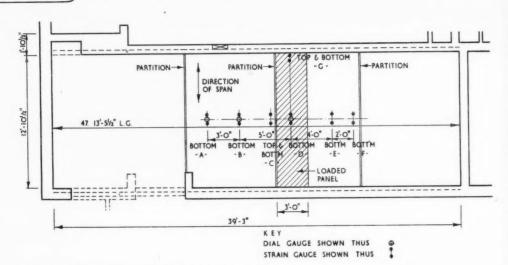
Plan of the test floor showing position of dial and strain gauges.
